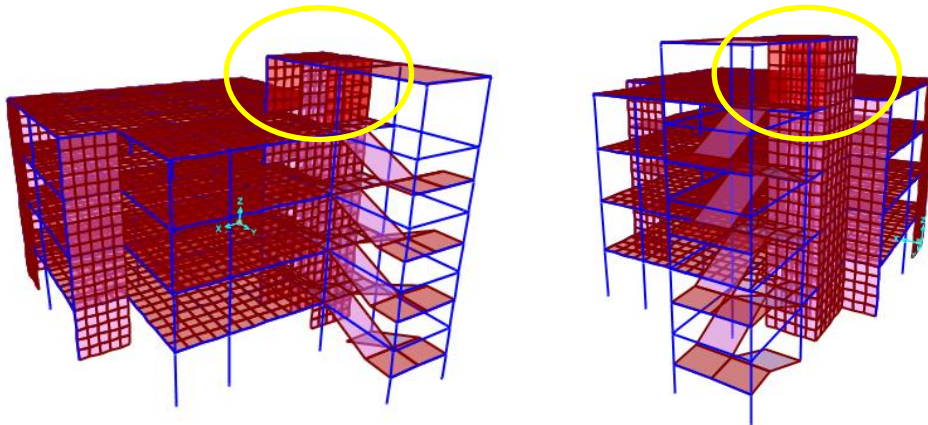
Proposed design change - extend elevator shaft to stairway-roof
